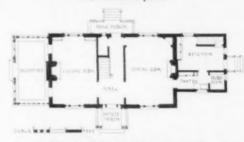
Central hall plan having extension at side. Floorarea 1,118 square feet, exclusive of porches
